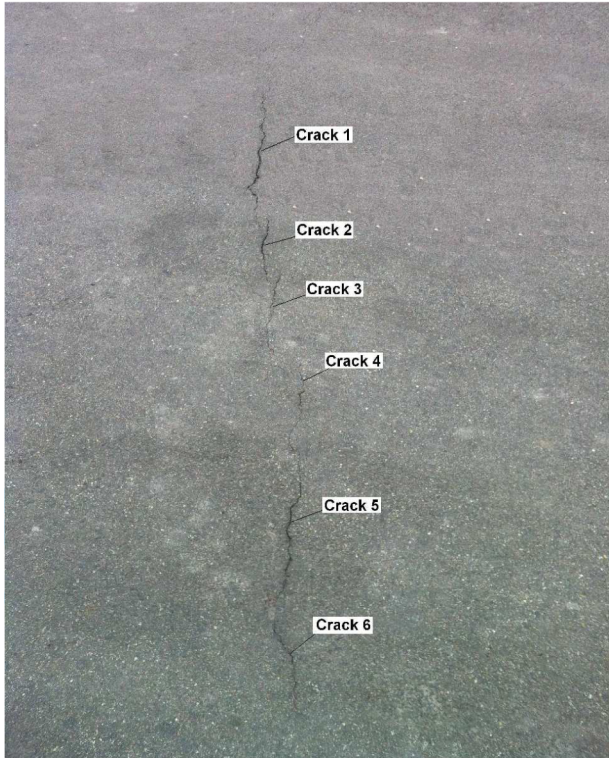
A group of nearly collinear cracks existing in a concrete structure.
